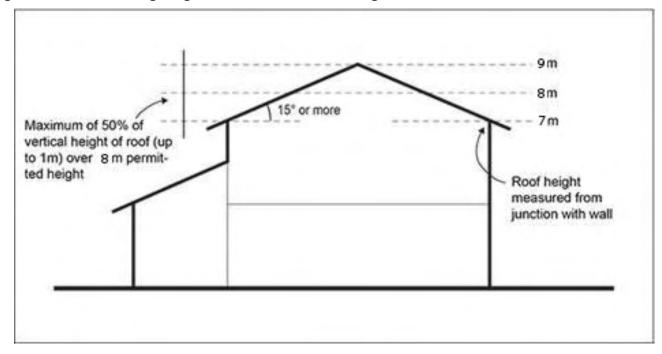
Building height in the Residential – Single House Zone
